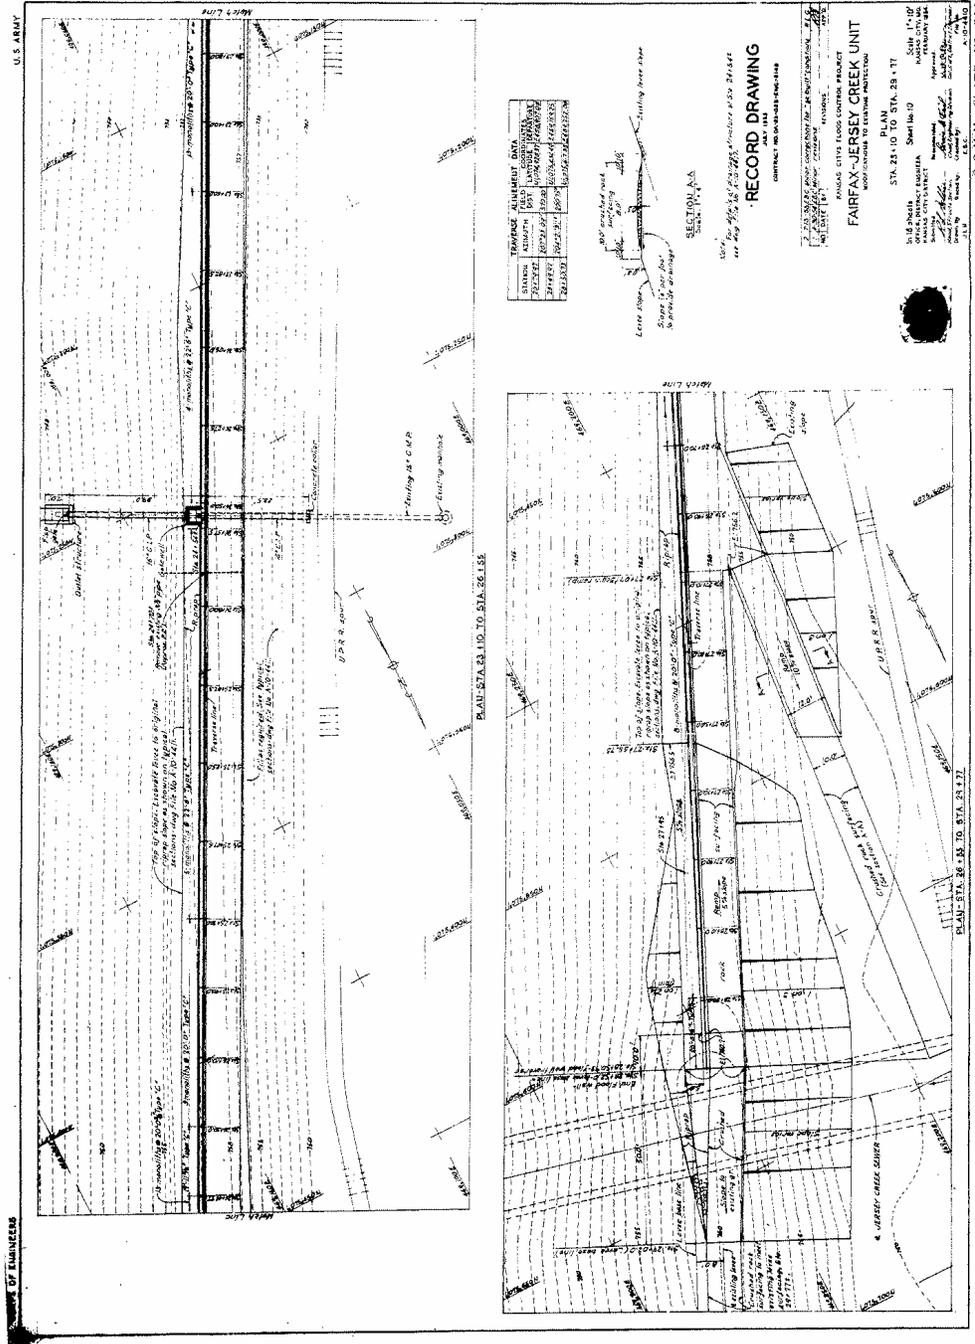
Modification to Existing Protection Plan and Profile
